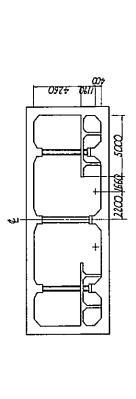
Outline of Station in 2 Double Tracks Section Example
